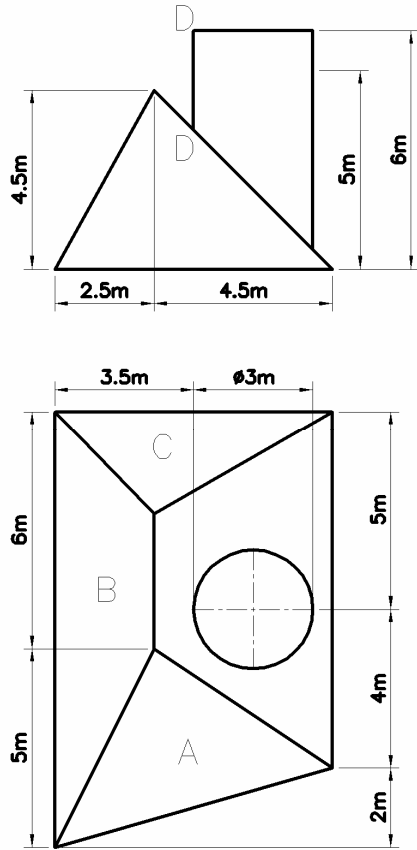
shows the plan and elevation of a roof structure with a cylindrical chimney pipe.
